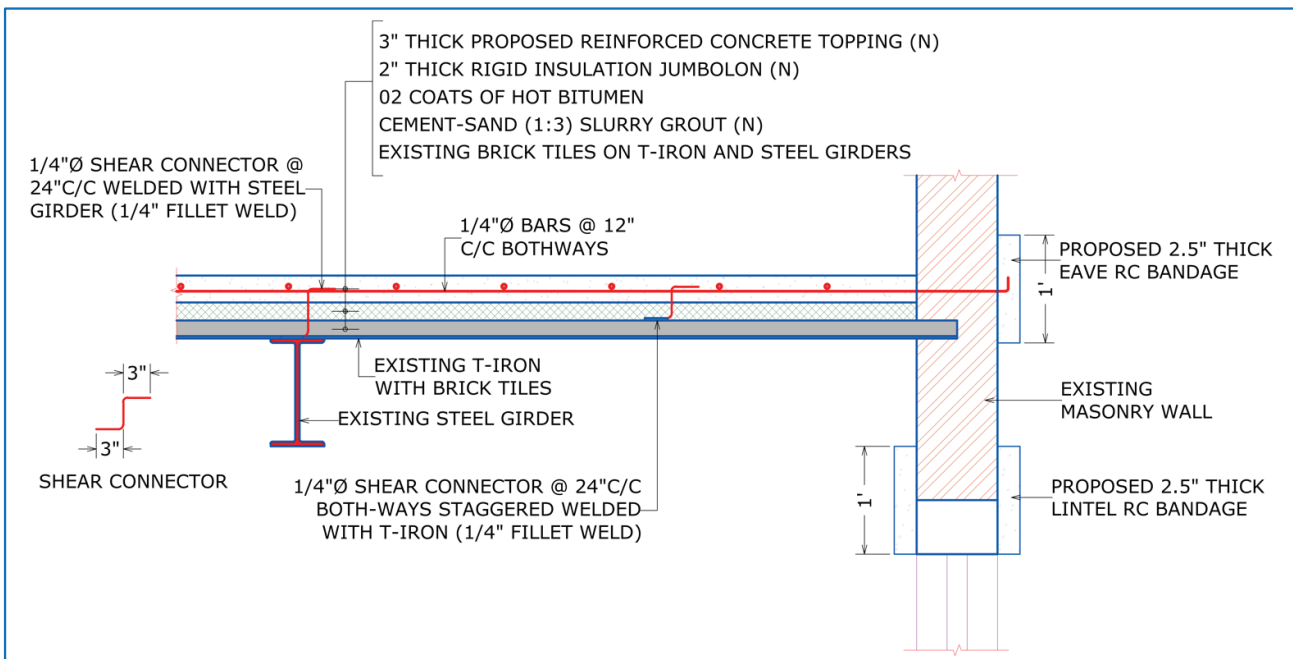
Strengthening of steel girder and inverted tee floor and roof (two-storey or one storey with tall parapet)
